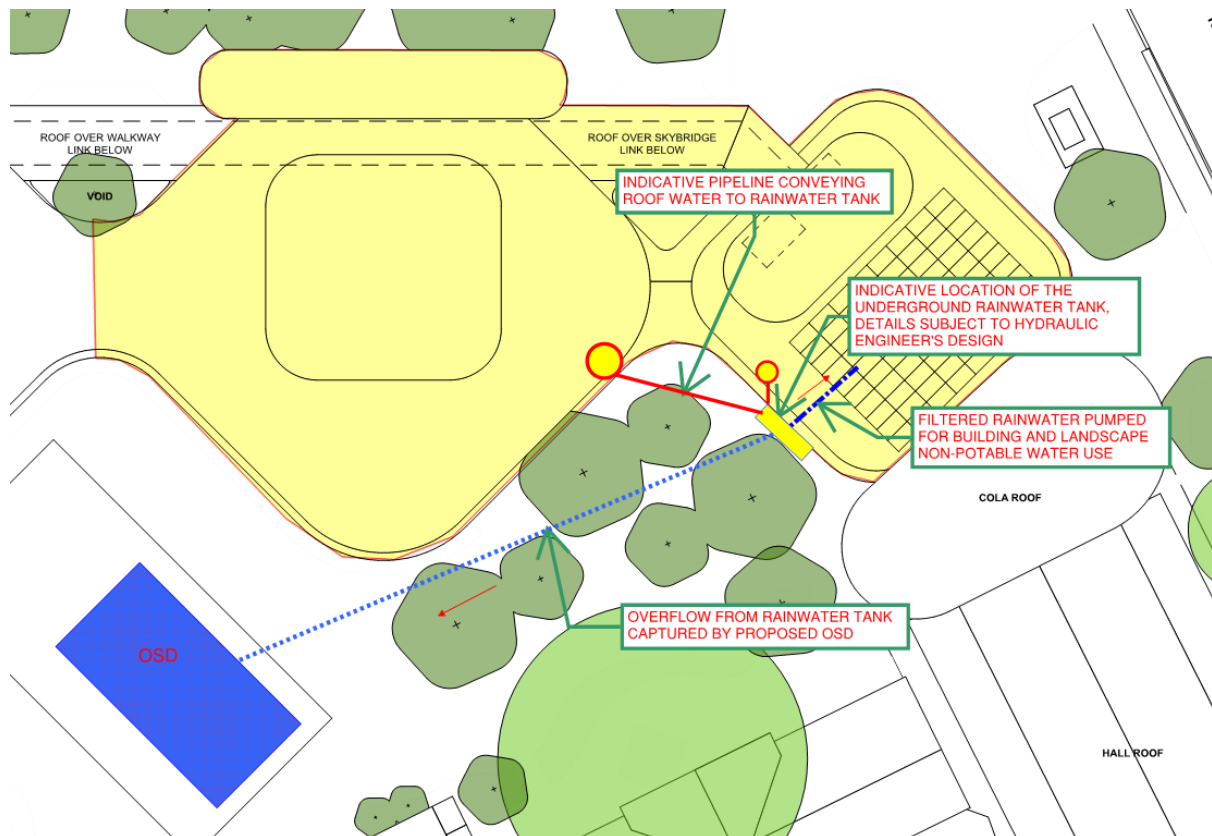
Site rainwater harvesting system (background: Roof Plan by Butler & Co Architects)
